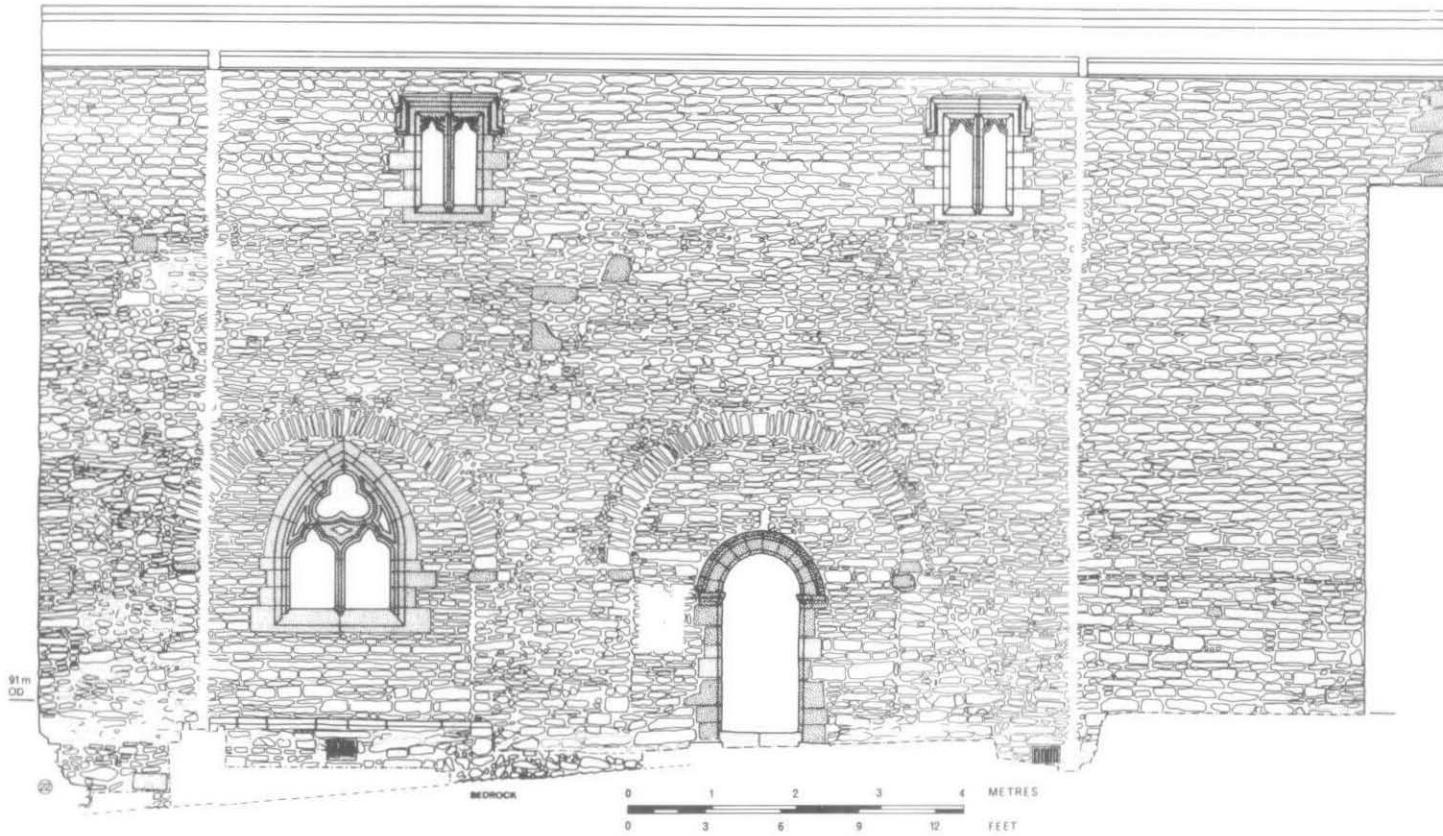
North wall of nave: external elevation, drawn by T. Morgan. Scale 1:90.
